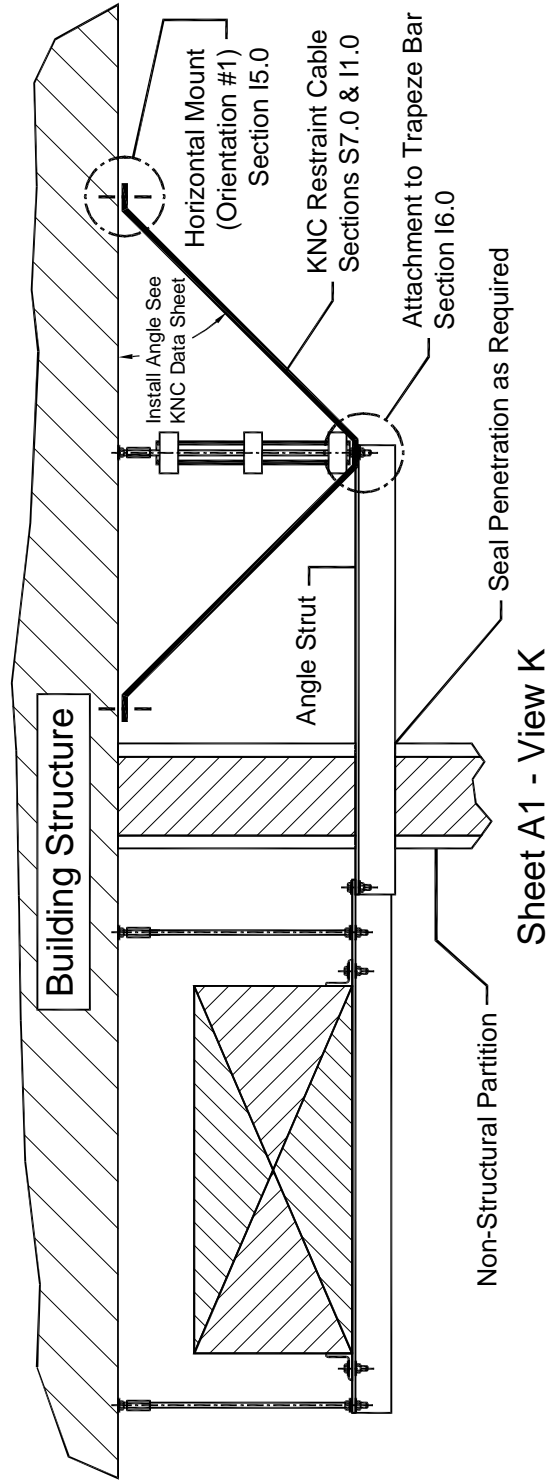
; Transverse (T) Cable Restraint Schematic Arrangement for Supported Rectangular Duct – Restrained with an Angle Strut Passing Through a Non-Structural Wall Using One Pair of Restraint – Obtain Permission from the Structural Engineer & Architect before Penetrating the Wall
